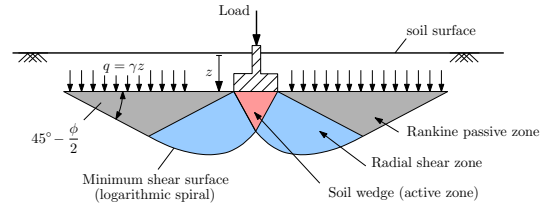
Assumed soil failure in case of shallow strip foundations
